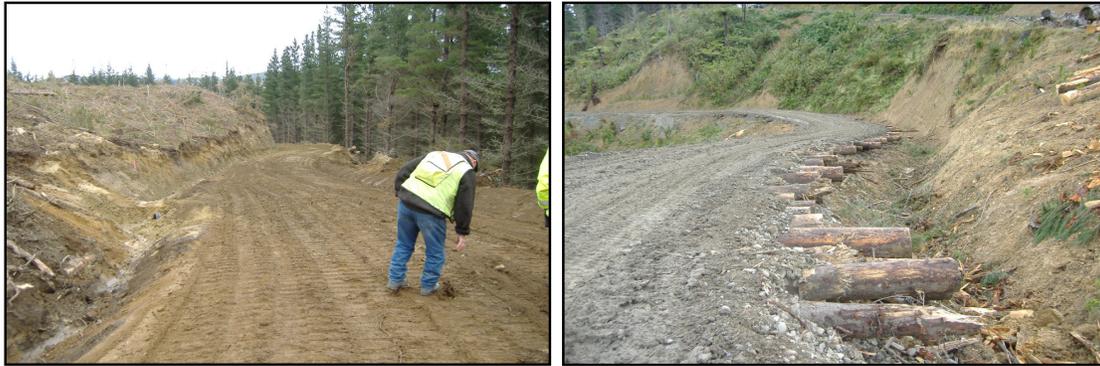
Examples of forest roads in the East Cape region of New Zealand. The left picture shows a prepared subgrade awaiting placement of aggregate. The right picture shows a road constructed with log corduroy after failure of the original road pavement.
